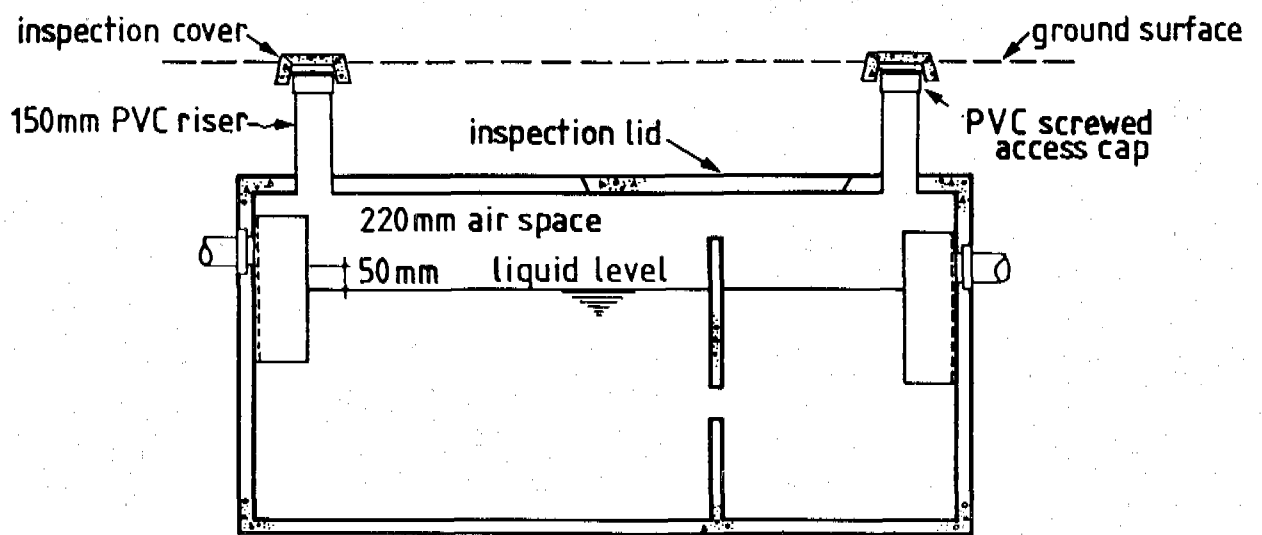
Schematic Section of Septic Tank showing PVC Risers, Inlet and Outlet and Air Space.
